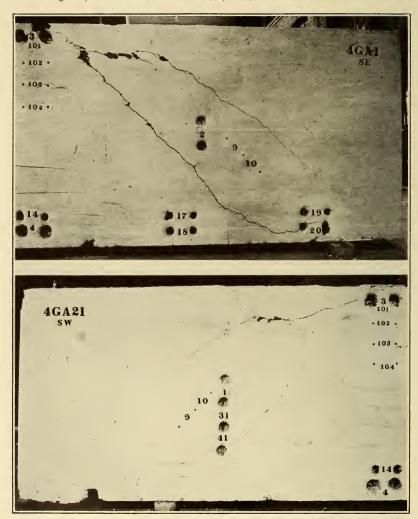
Rectangular beams 4GA1 and 4GA21 after failure
